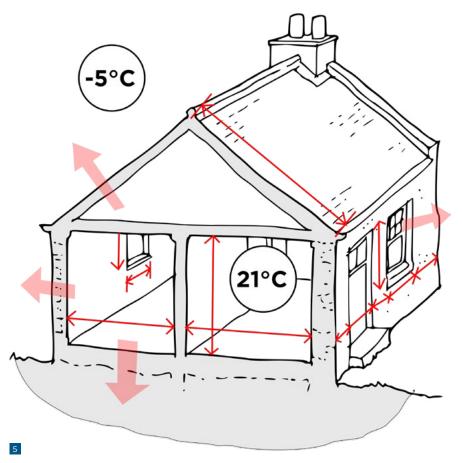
An accurate heat loss calculation requires a detailed survey of the building.
